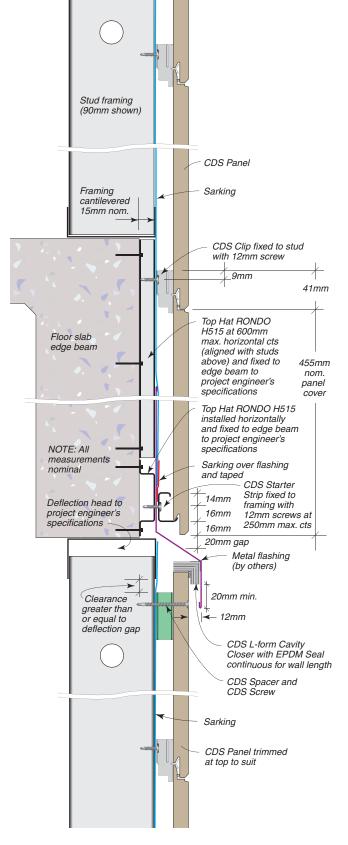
CDS Framing and Control Joint Detail at Edge Beam – Edge Beam height less than approx. 450mm {Continuous Wall Wrap/Sarking method shown) FIG 33: CDS Framing and Control Joint Detail at Edge Beam – Edge Beam height greater than 500mm (Discontinuous Wall Wrap/Sarking method shown)
